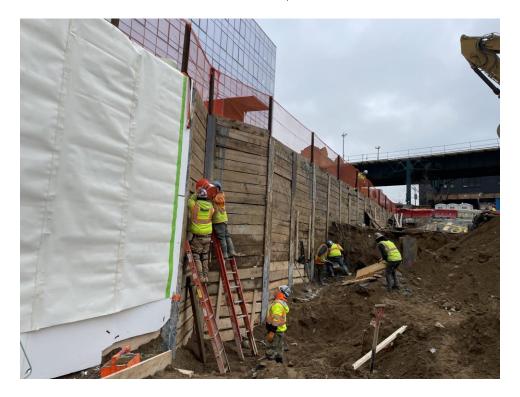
ECD installing waterproofing and SOE lagging in the southeastern part of the site (facing west).
